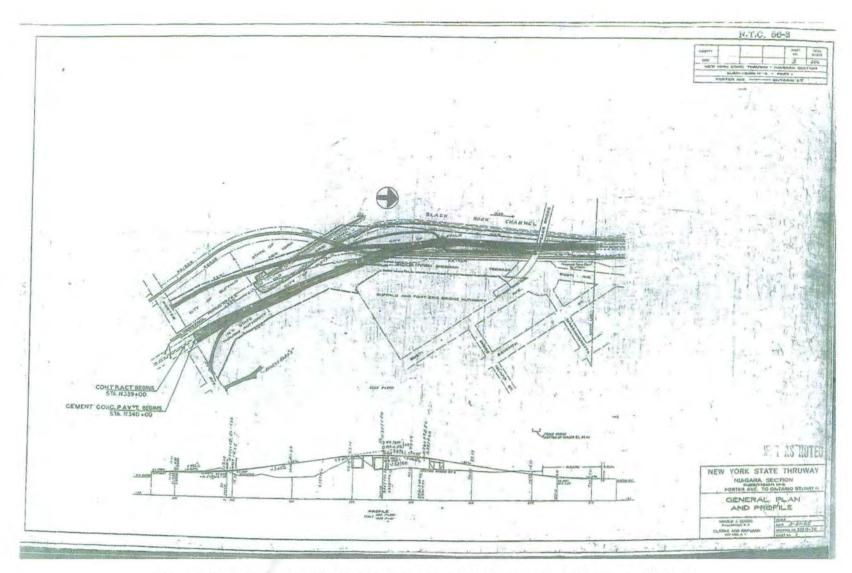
General Plan and Profile Sheet No. 3, New York State Thruway, Niagara Section, dated 3-21-55.
